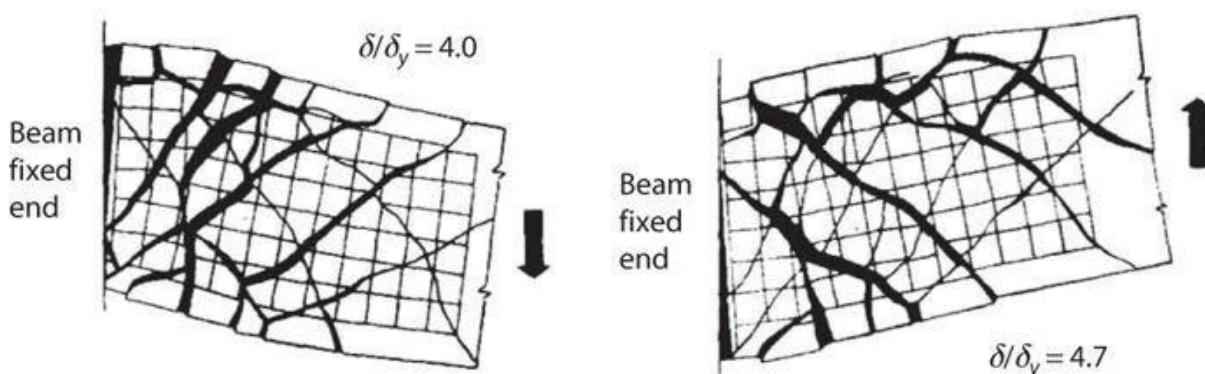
Surface deformations and cracks of beam in advanced stages of cyclic loading. Crack widths and deformations are amplified by factor 5.0 (After Popov, 1984).
